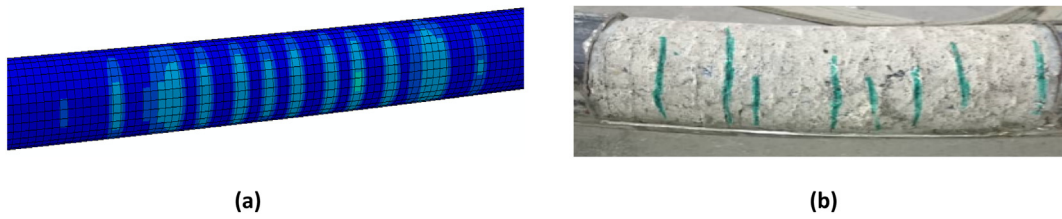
Cracks pattern of concrete infill at the soffit of CFSTs; (a) FE simulation (b) Tested specimen.
